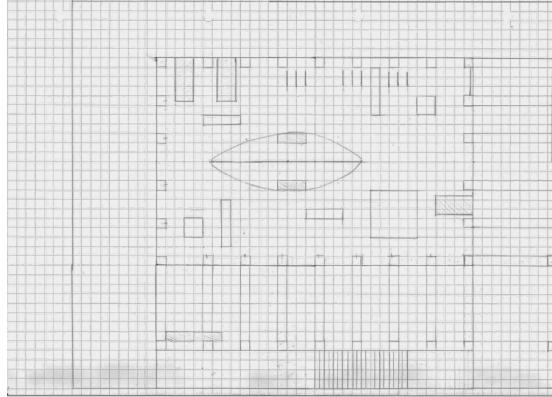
Drawing of the Chemistry Building courtyard floorplan.
